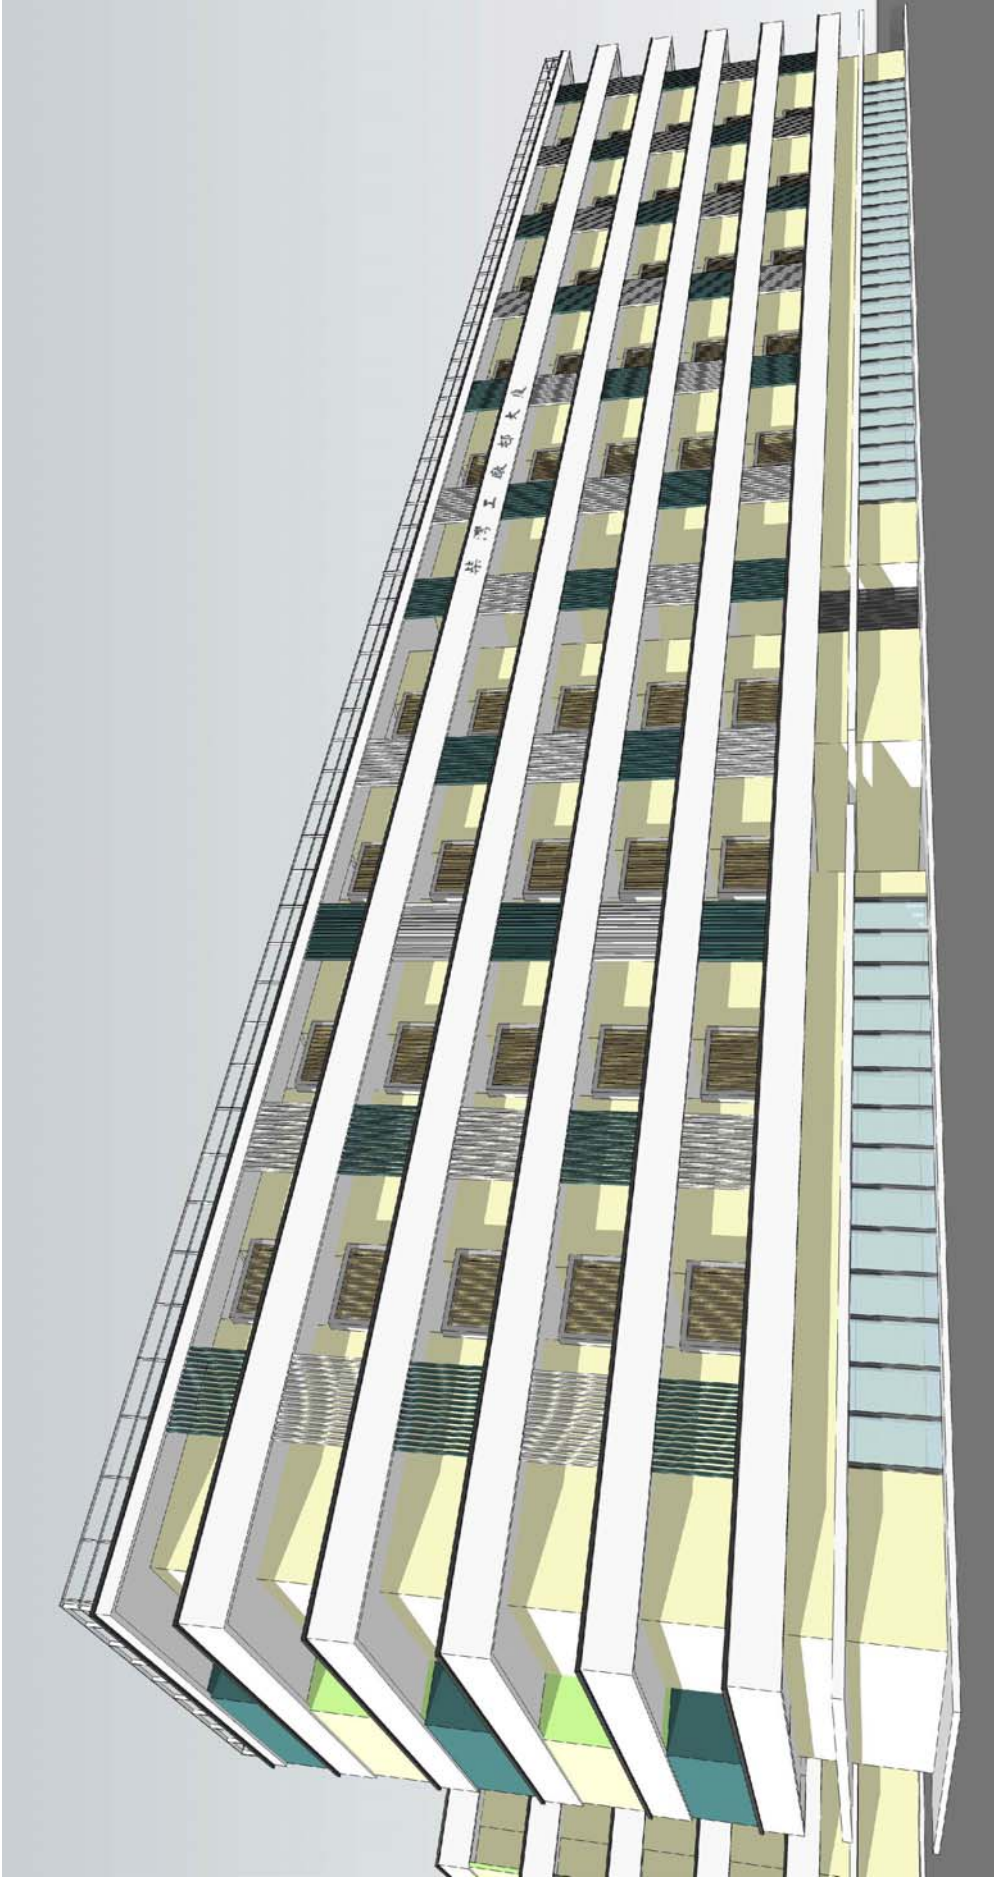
Artistic Impression of the Proposed Design vViewing from Lee Chung Street
